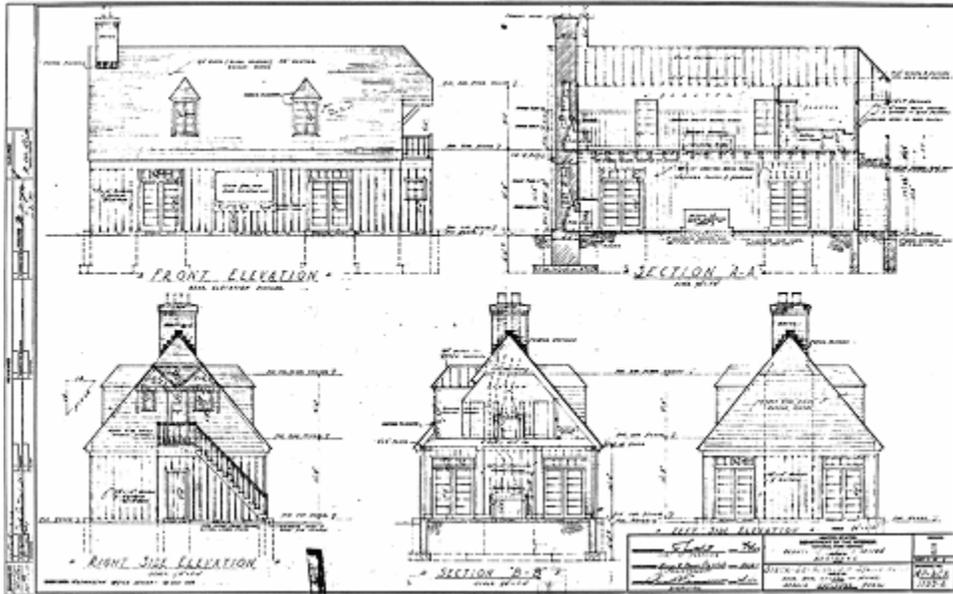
Plan of a new spring building at Sieur de Monts Spring, from 1940. Note the three exterior water fountains on the south, or “front,” elevation. The structure was opened to the public in 1942. (ACAD_123_1183A, Denver Service Center)
